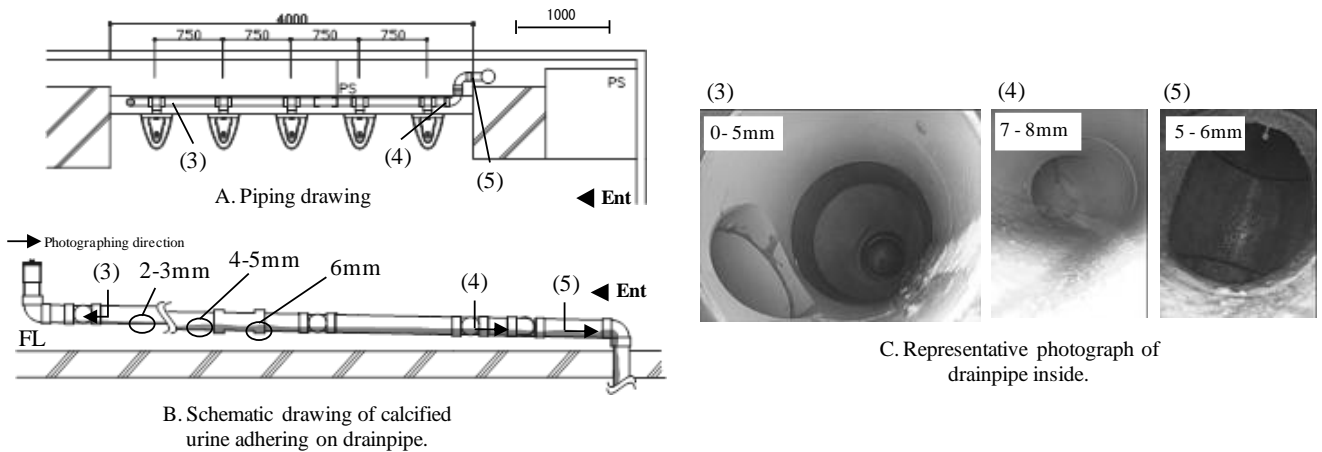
Piping drawing, schematic drawing of calcified urine and photograph of drainpipe at School Facility A
